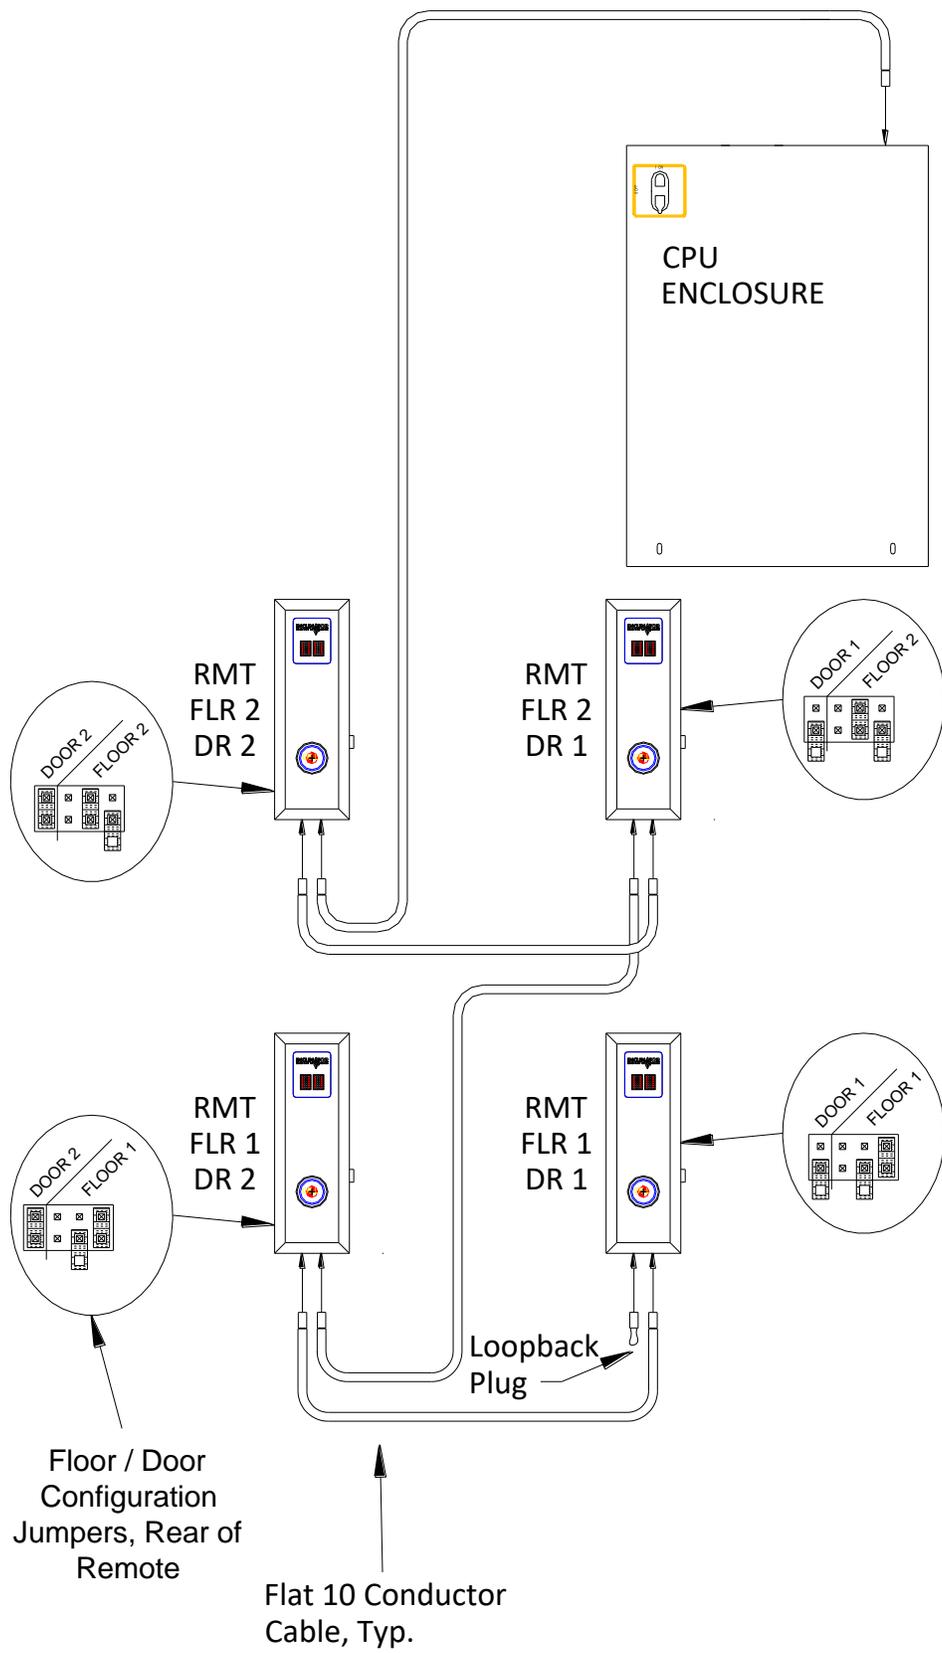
CPU ENCLOSURE - ATTIC MOUNT, 2 FLOORS, 2 DOORS
